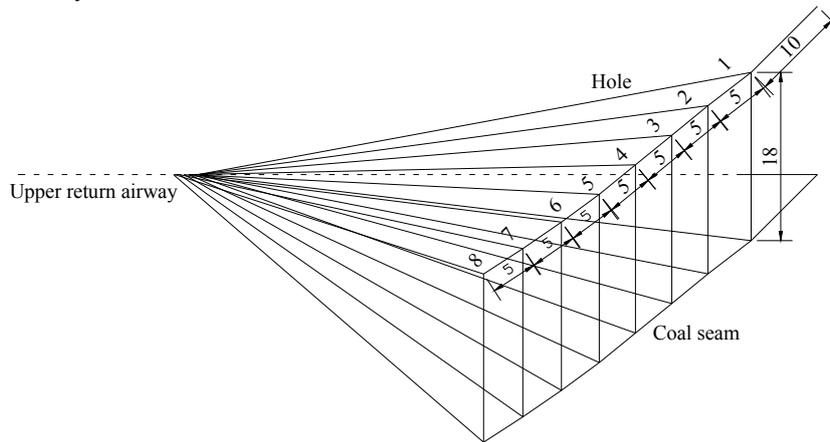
Sketch of roof highly-located gas drainage holes (unit: m)
